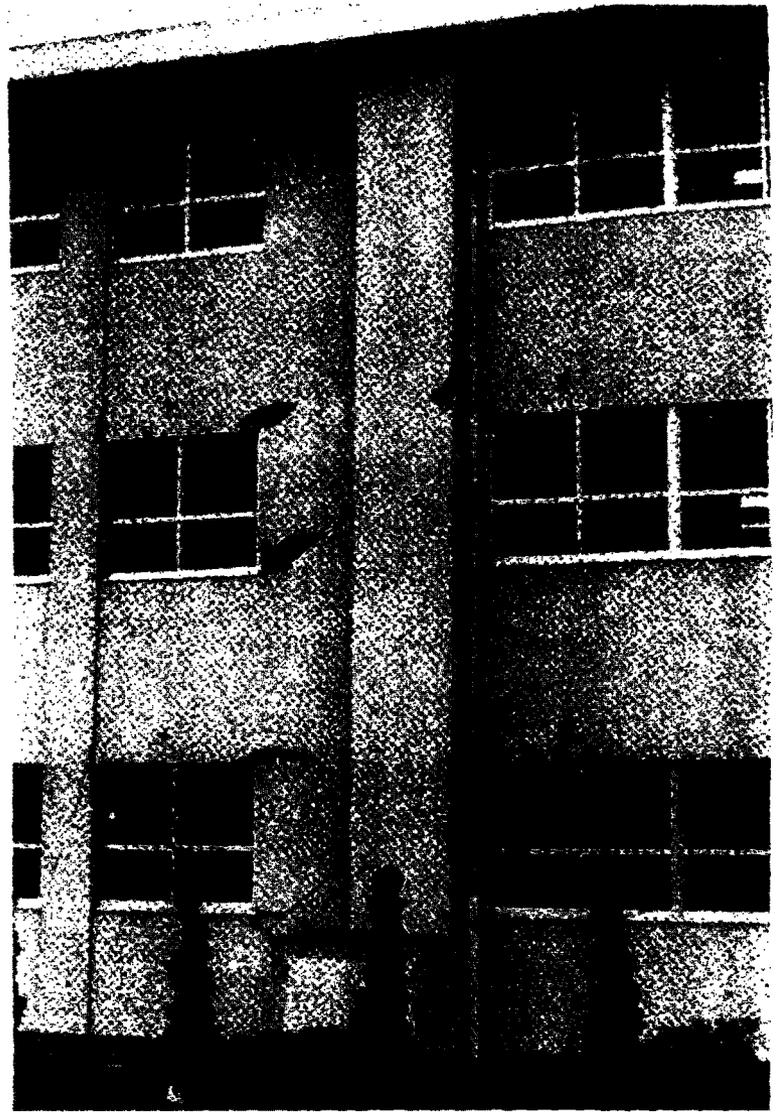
Izumi High School, typical classroom building, north face. All faces with the larger infill panels were similarly damaged.
